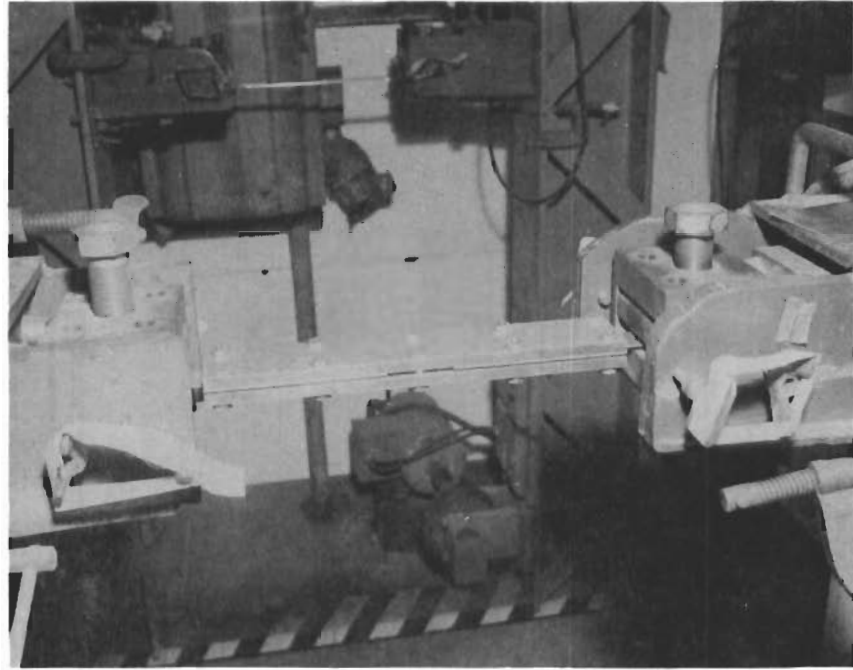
TEST SPECIMENS WITH SUPPORT PLATES
